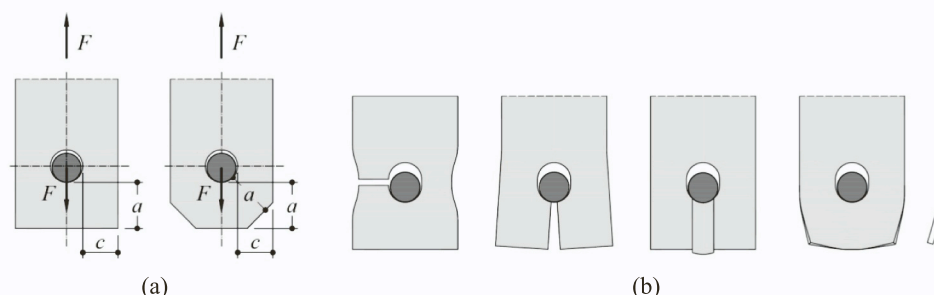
Tests by Johnston [14]: (a) Specimen geometry; (b) Failure modes (from left to right, tension failure, plate splitting, plate shearing, plate dishing).
